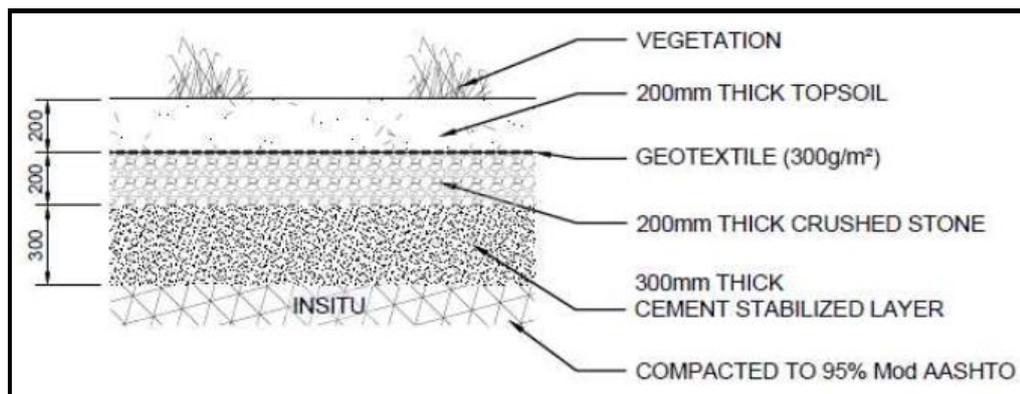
Proposed Capping layerworks for the Green Areas (source: Walters, 2020)
